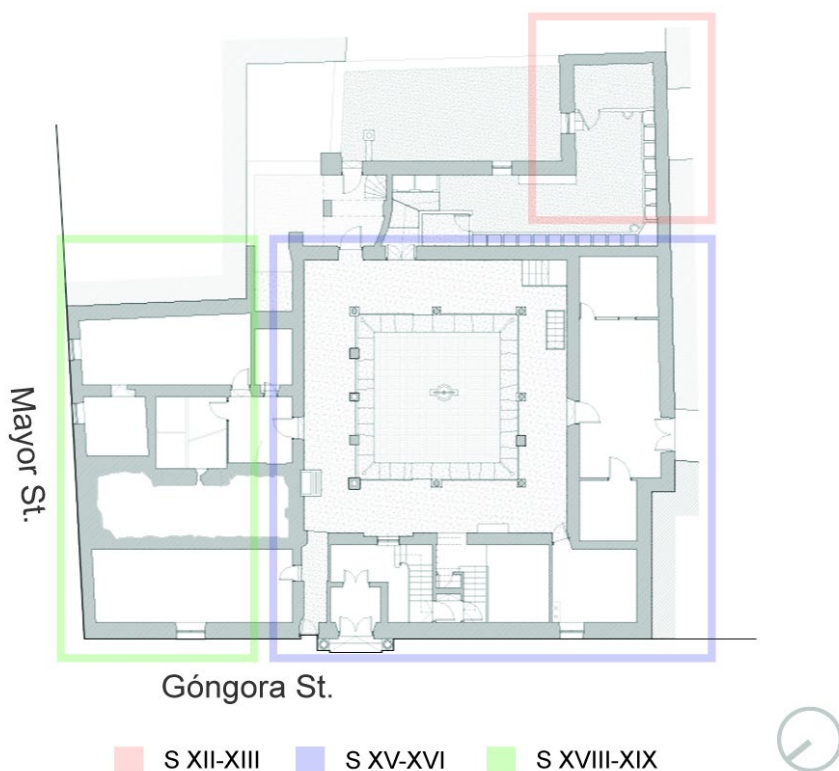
Ground floor plan. Current state of the house of Góngora (edited from the original drawing of arq. Juan Antonio Durán Blázquez).
